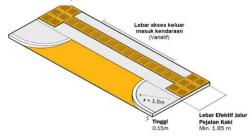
Vehicle Entry and Exit Access Road Source: Technical Planning of Pedestrian Facilities of the Ministry of PUPR. 2023
